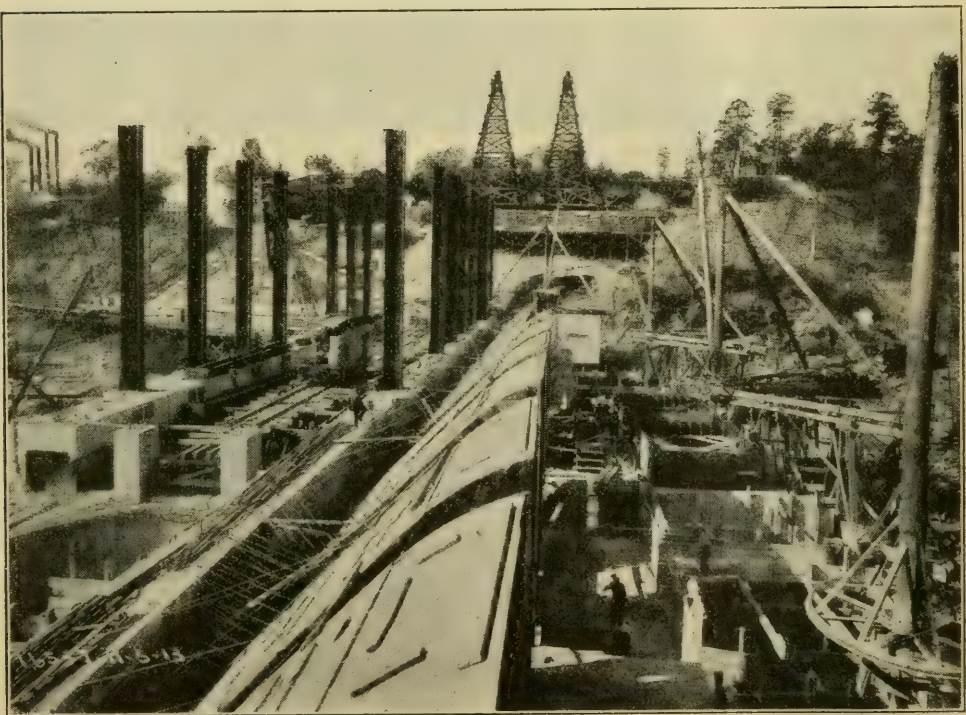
PENSTOCK FORMS UNDER CONSTRUCTION. LOCOMOTIVE CRANE SETTING UP COLUMNS OF POWER-HOUSE.
